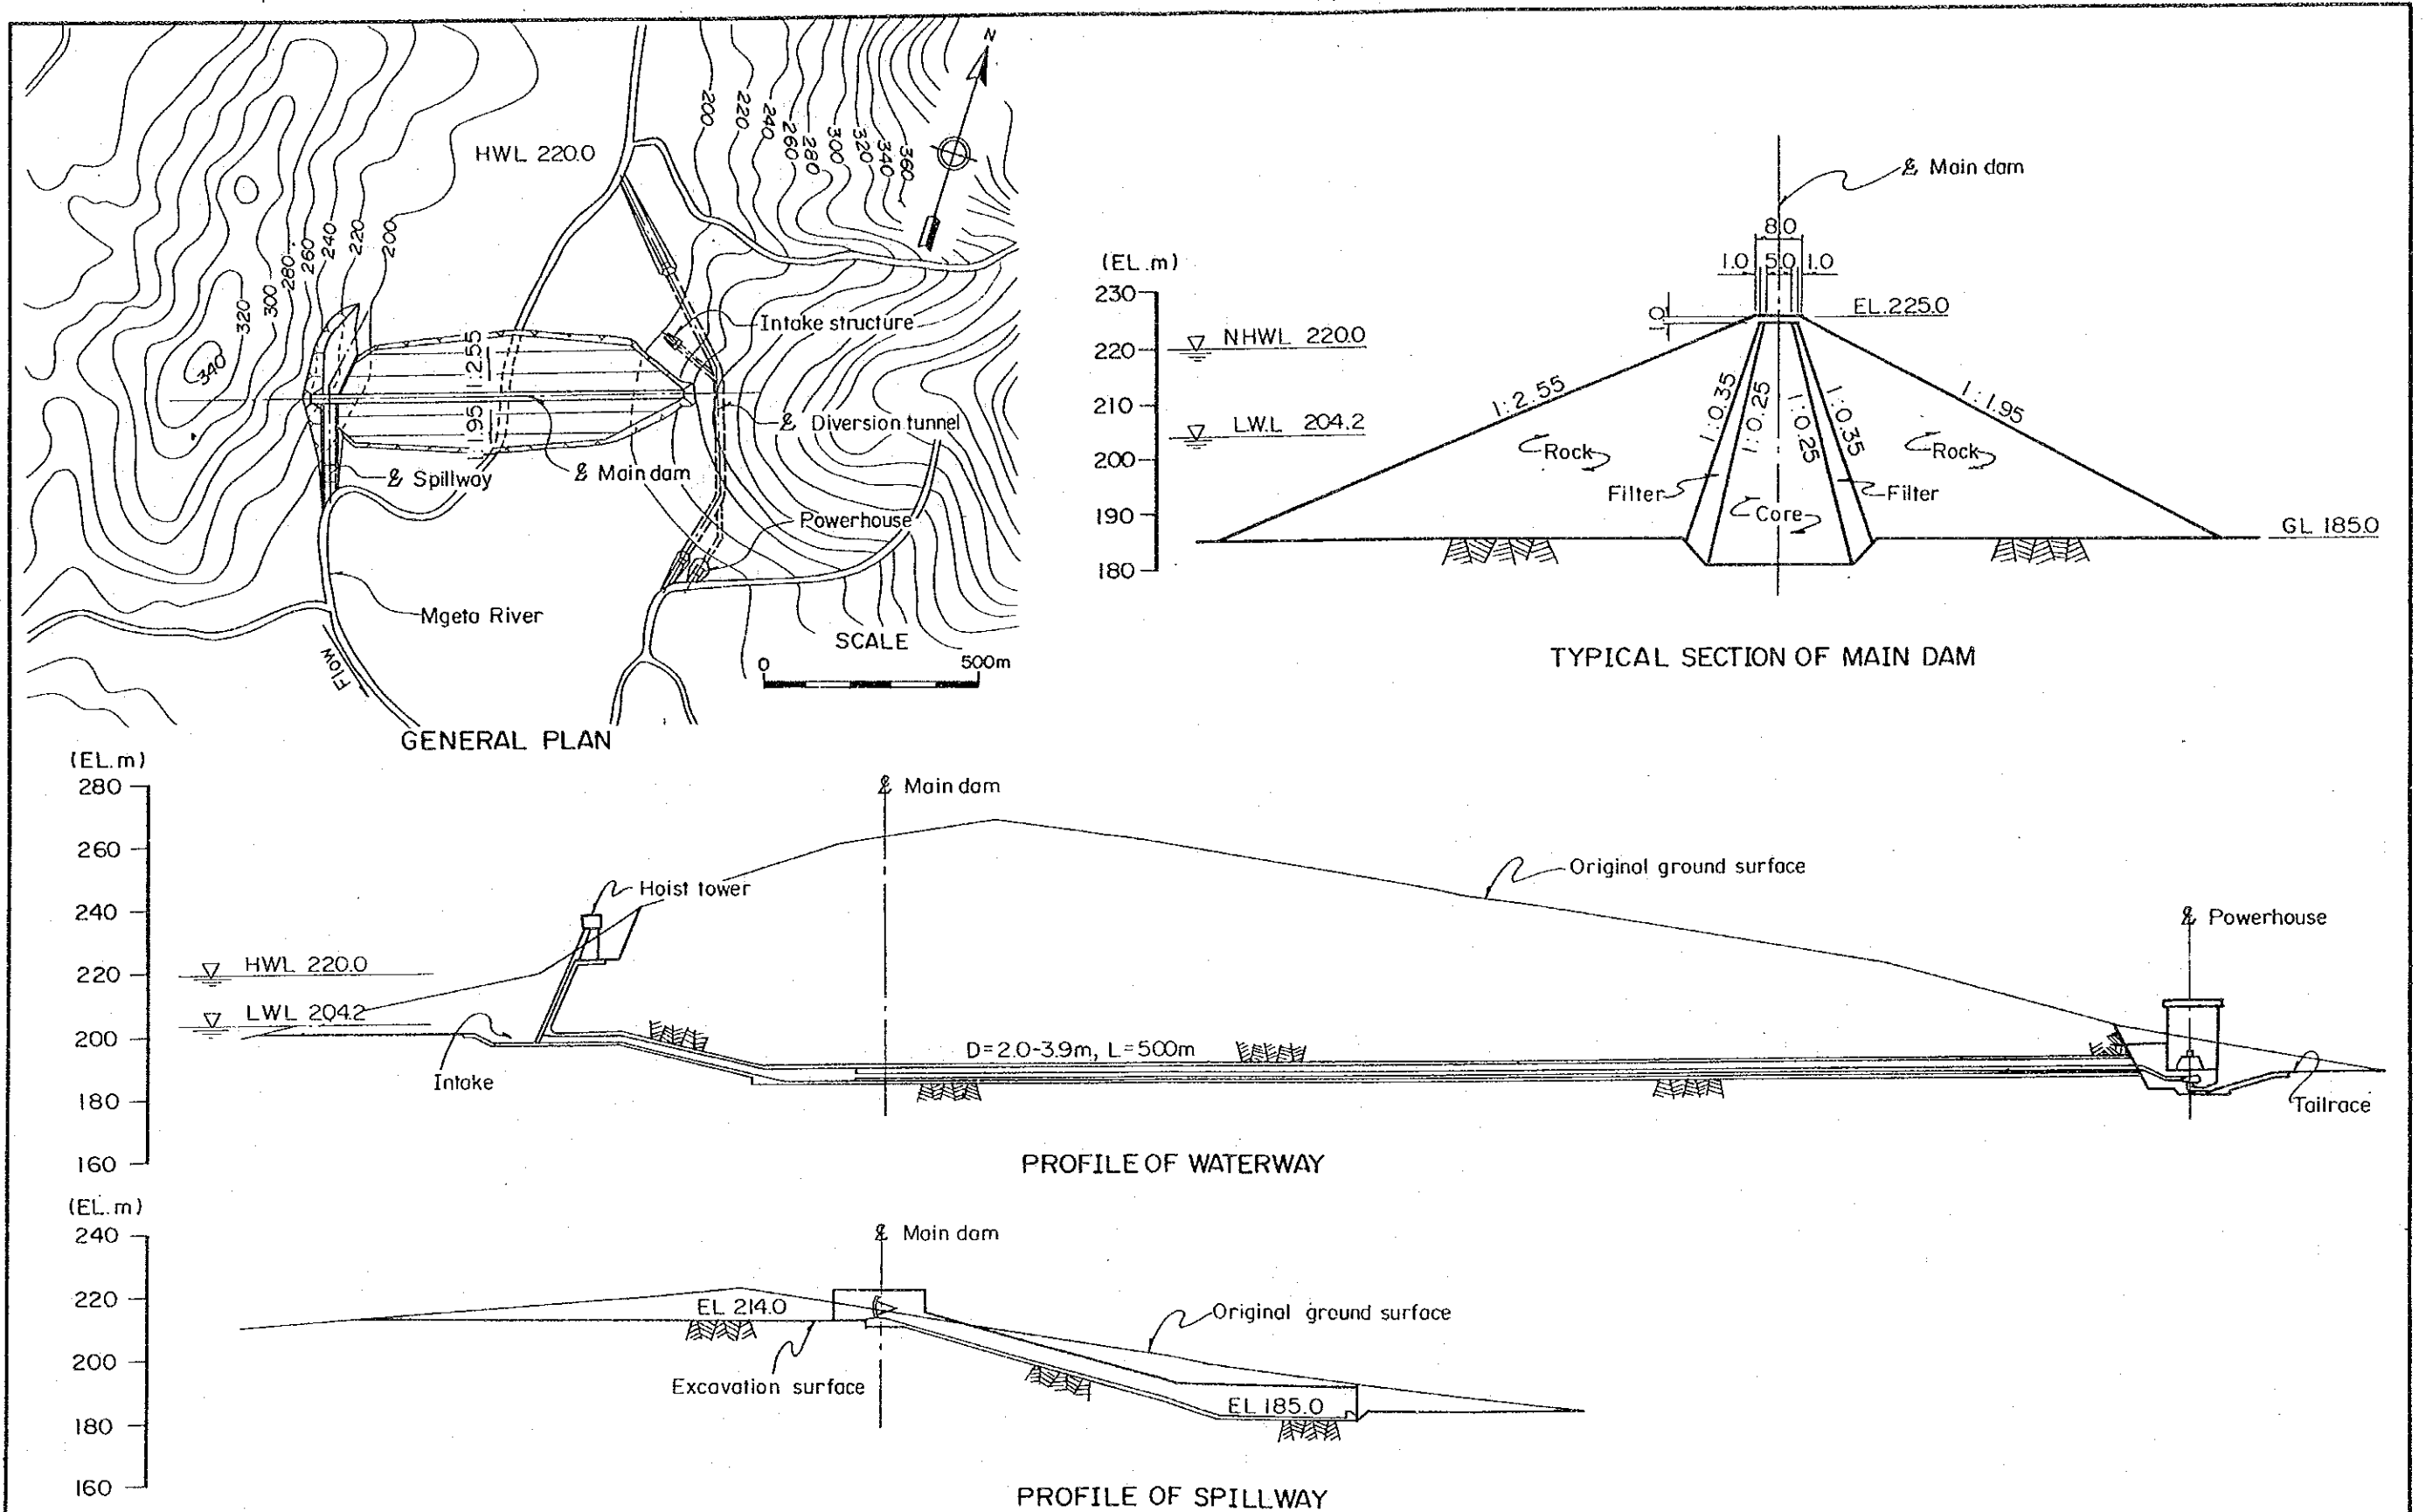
LAYOUT PLAN OF MGETA DAM PROJECT
